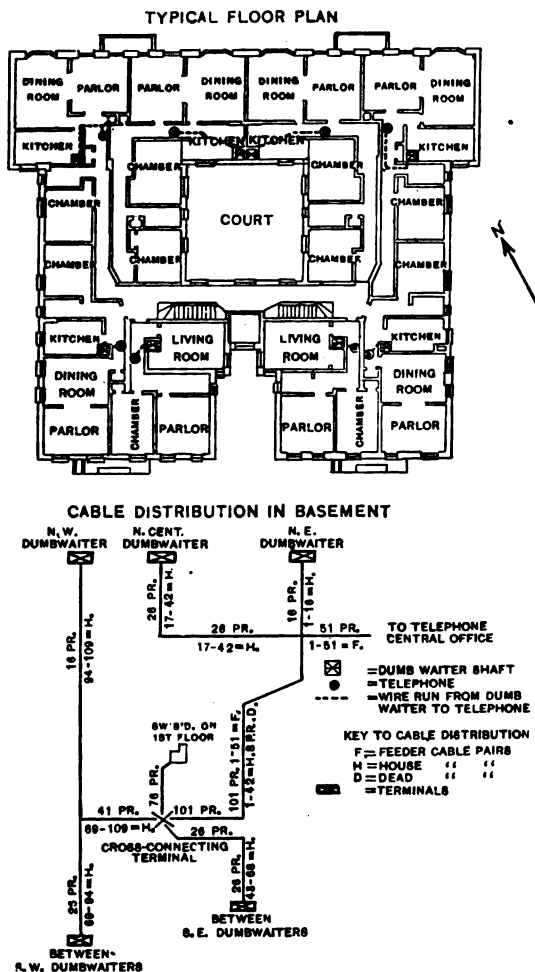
6-STORY NON-ELEVATOR APARTMENT HOUSE.
